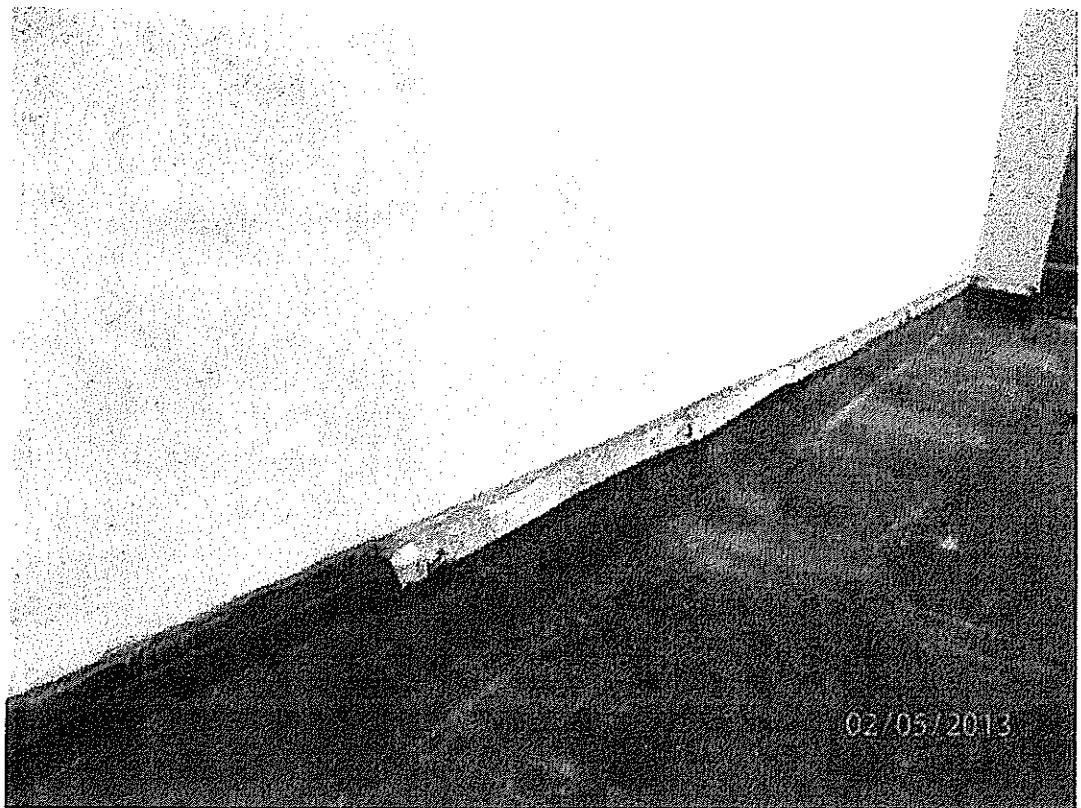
Roof View 2140 Market Street, Philadelphia, PA
